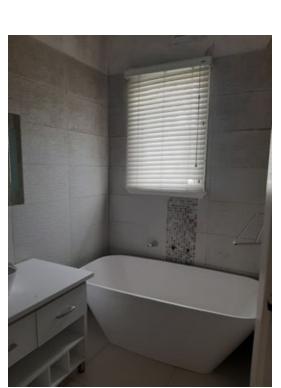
Internal view of bathroom. Has been recently revamped to a modern finish
